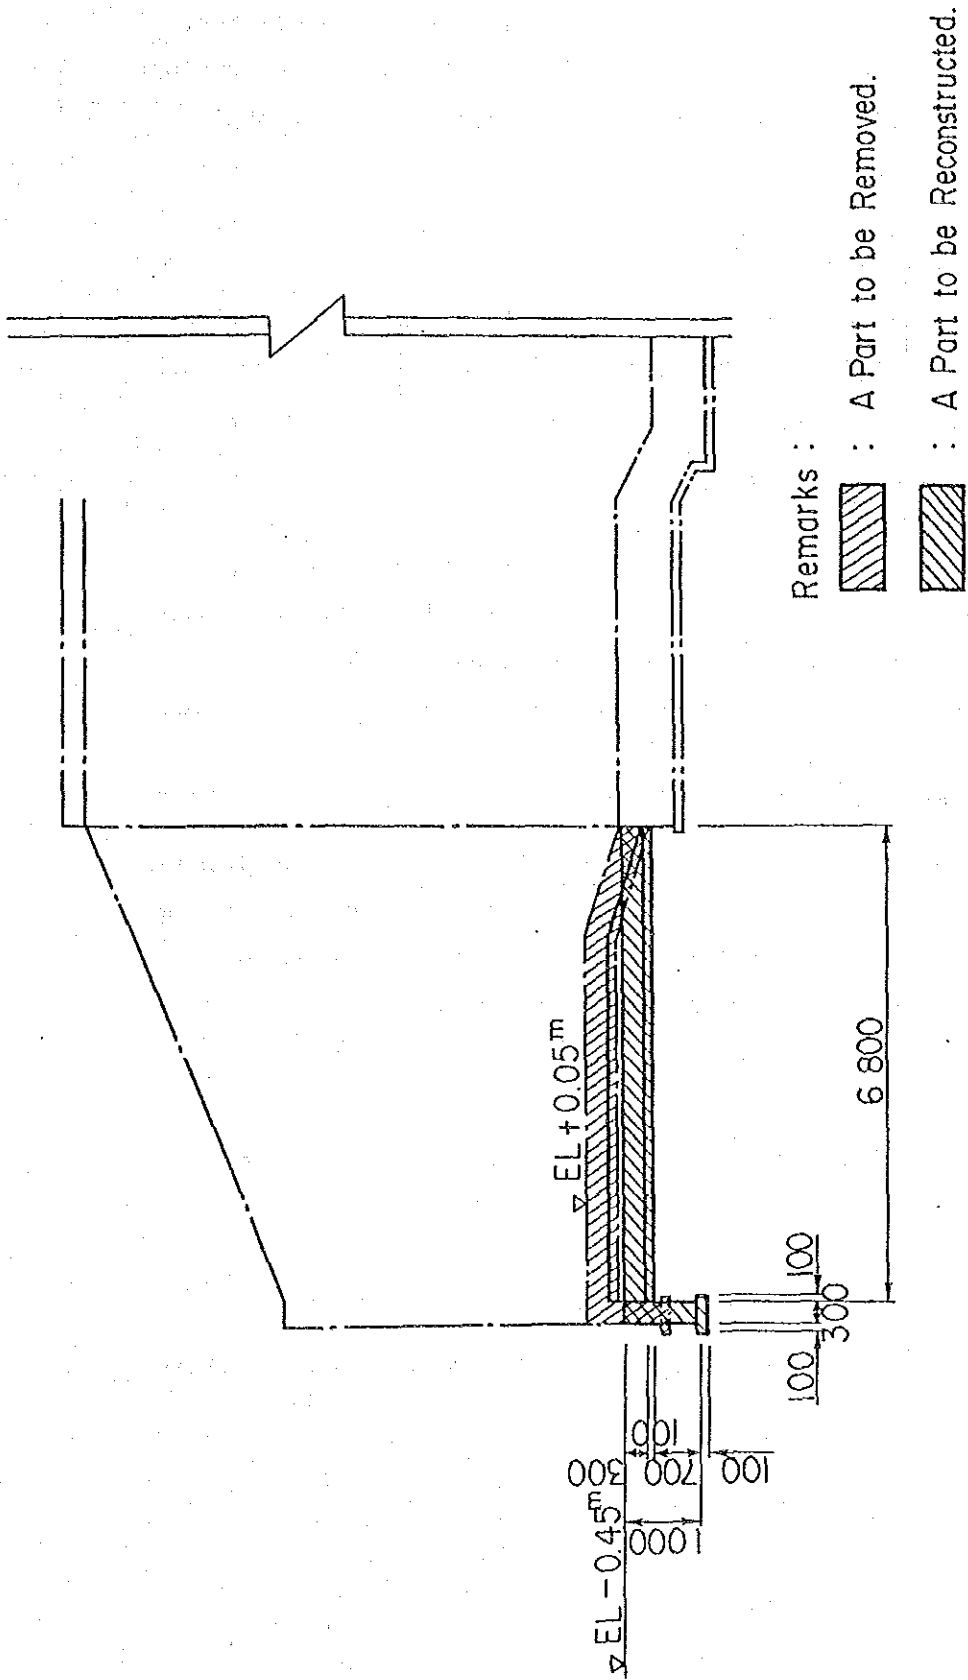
Sketch of Inlet Apron to be Improved
